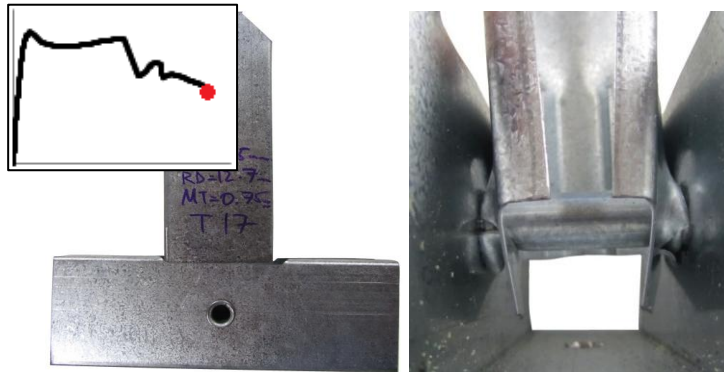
Example of Bearing Failure (0.75mm Member; 12.7x0.95mm HRC)
